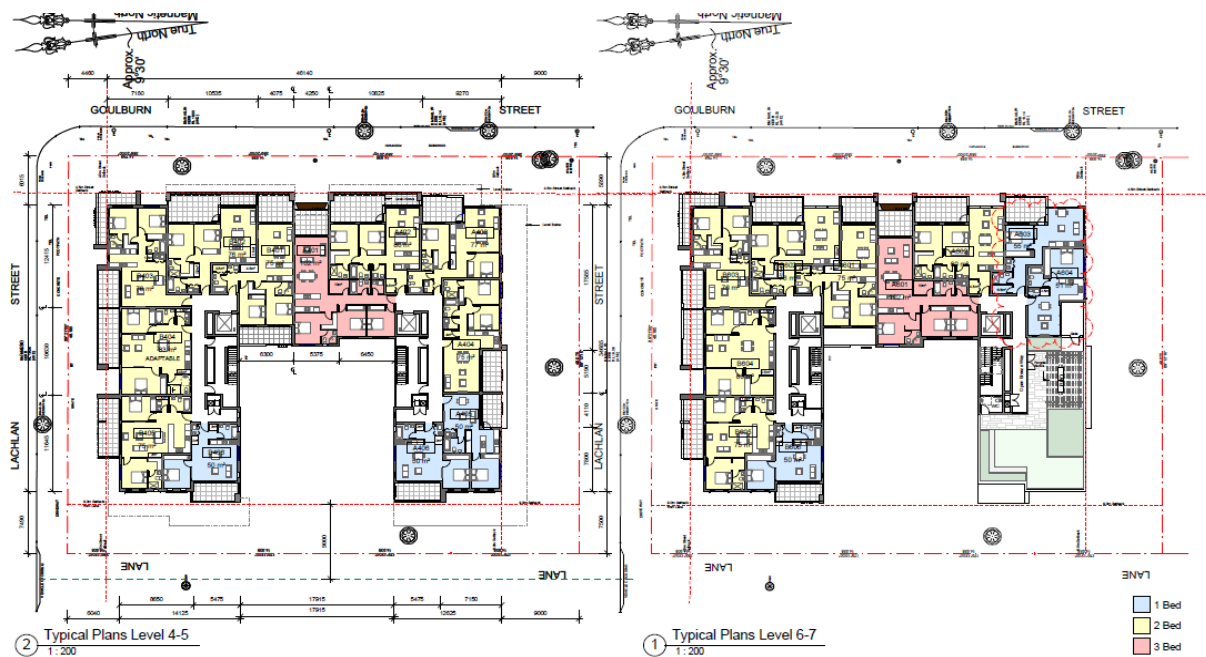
View of Levels 4-7 of the amended proposal, consisting of a 9-storey building facing Goulburn St and Lachlan St and a 6-storey south wing facing Goulburn Lane. The rooftop communal open space on top of the north wing of the building has been replaced with apartments.
